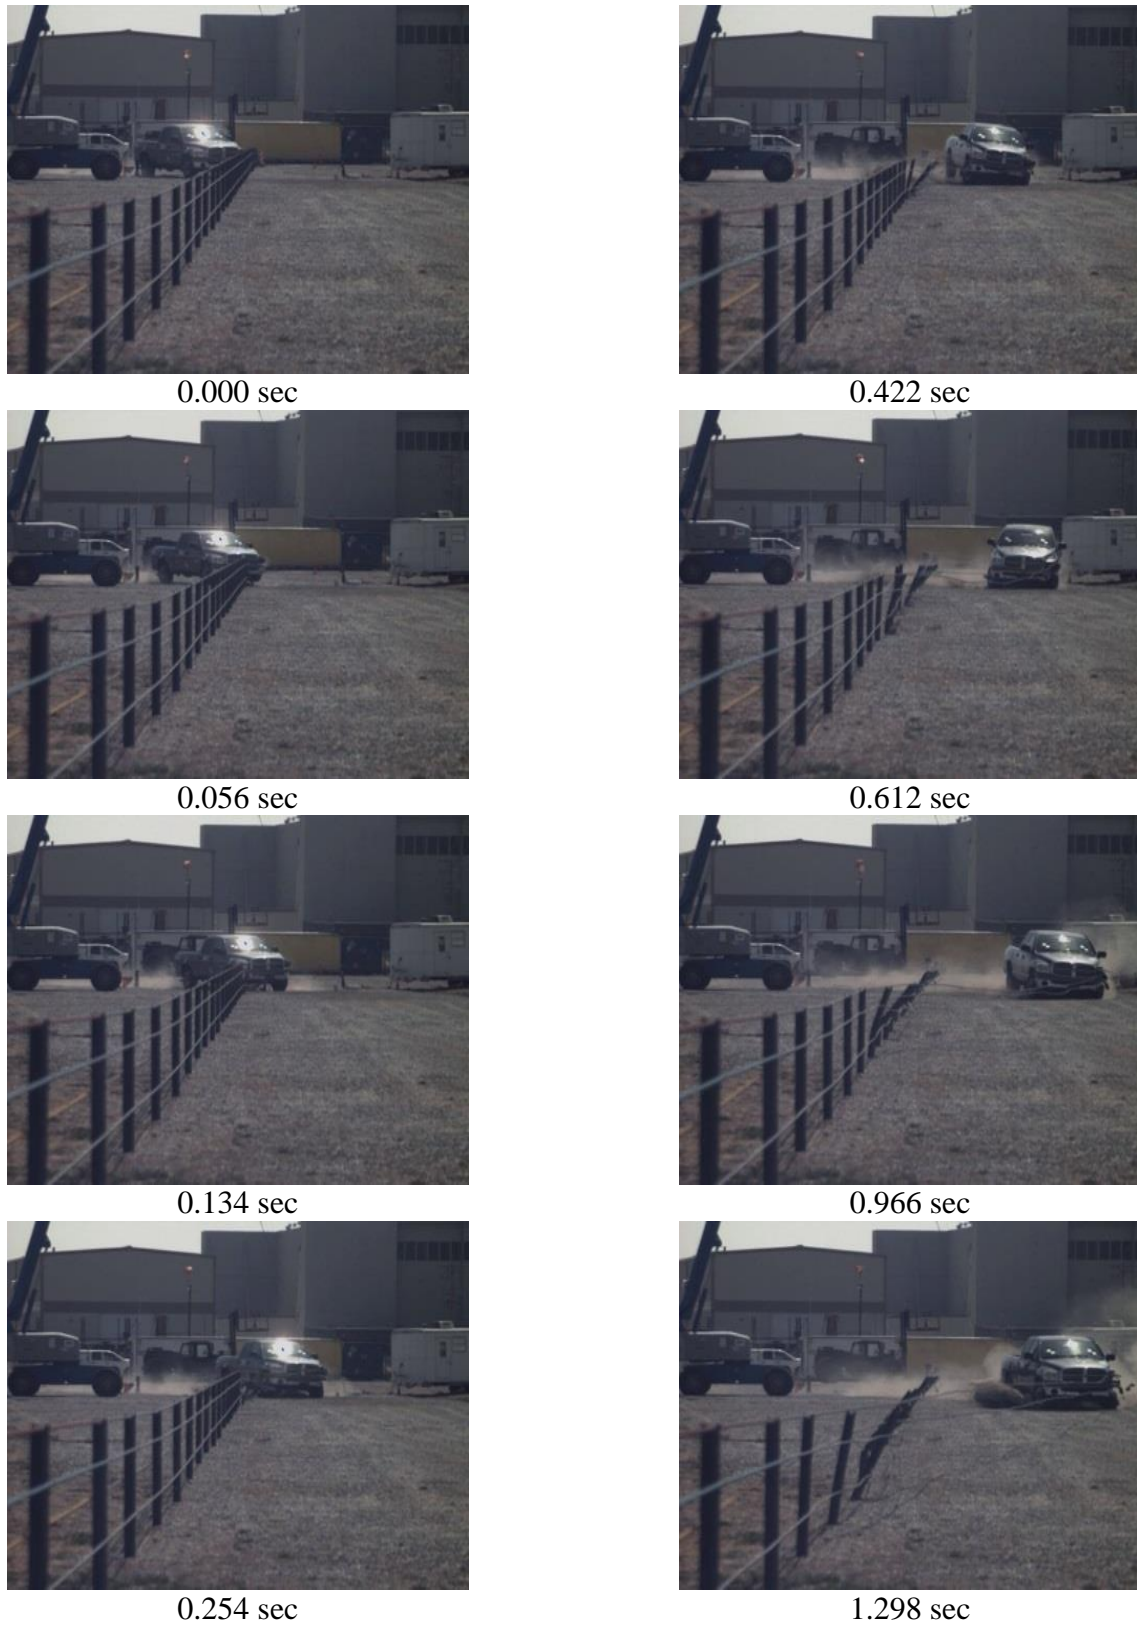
Additional Sequential Photographs, Test No. MWP-2
